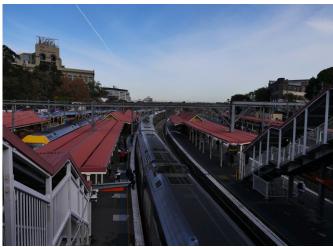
View looking south from the existing Lawson Street Concourse towards the platforms (Source: AECOM)
